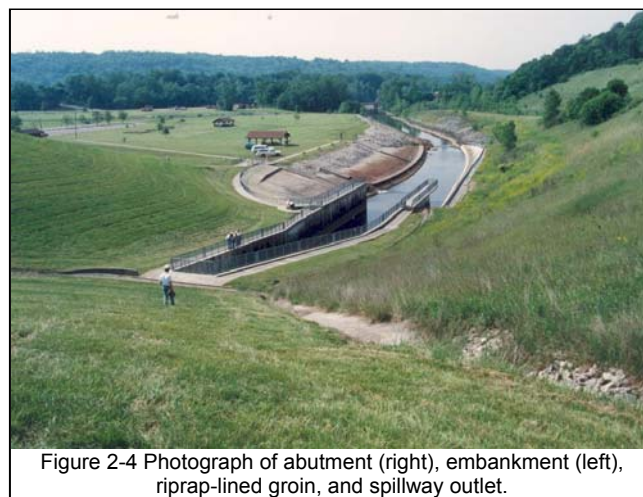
Photograph of abutment (right), embankment (left), riprap-lined groin, and spillway outlet.
